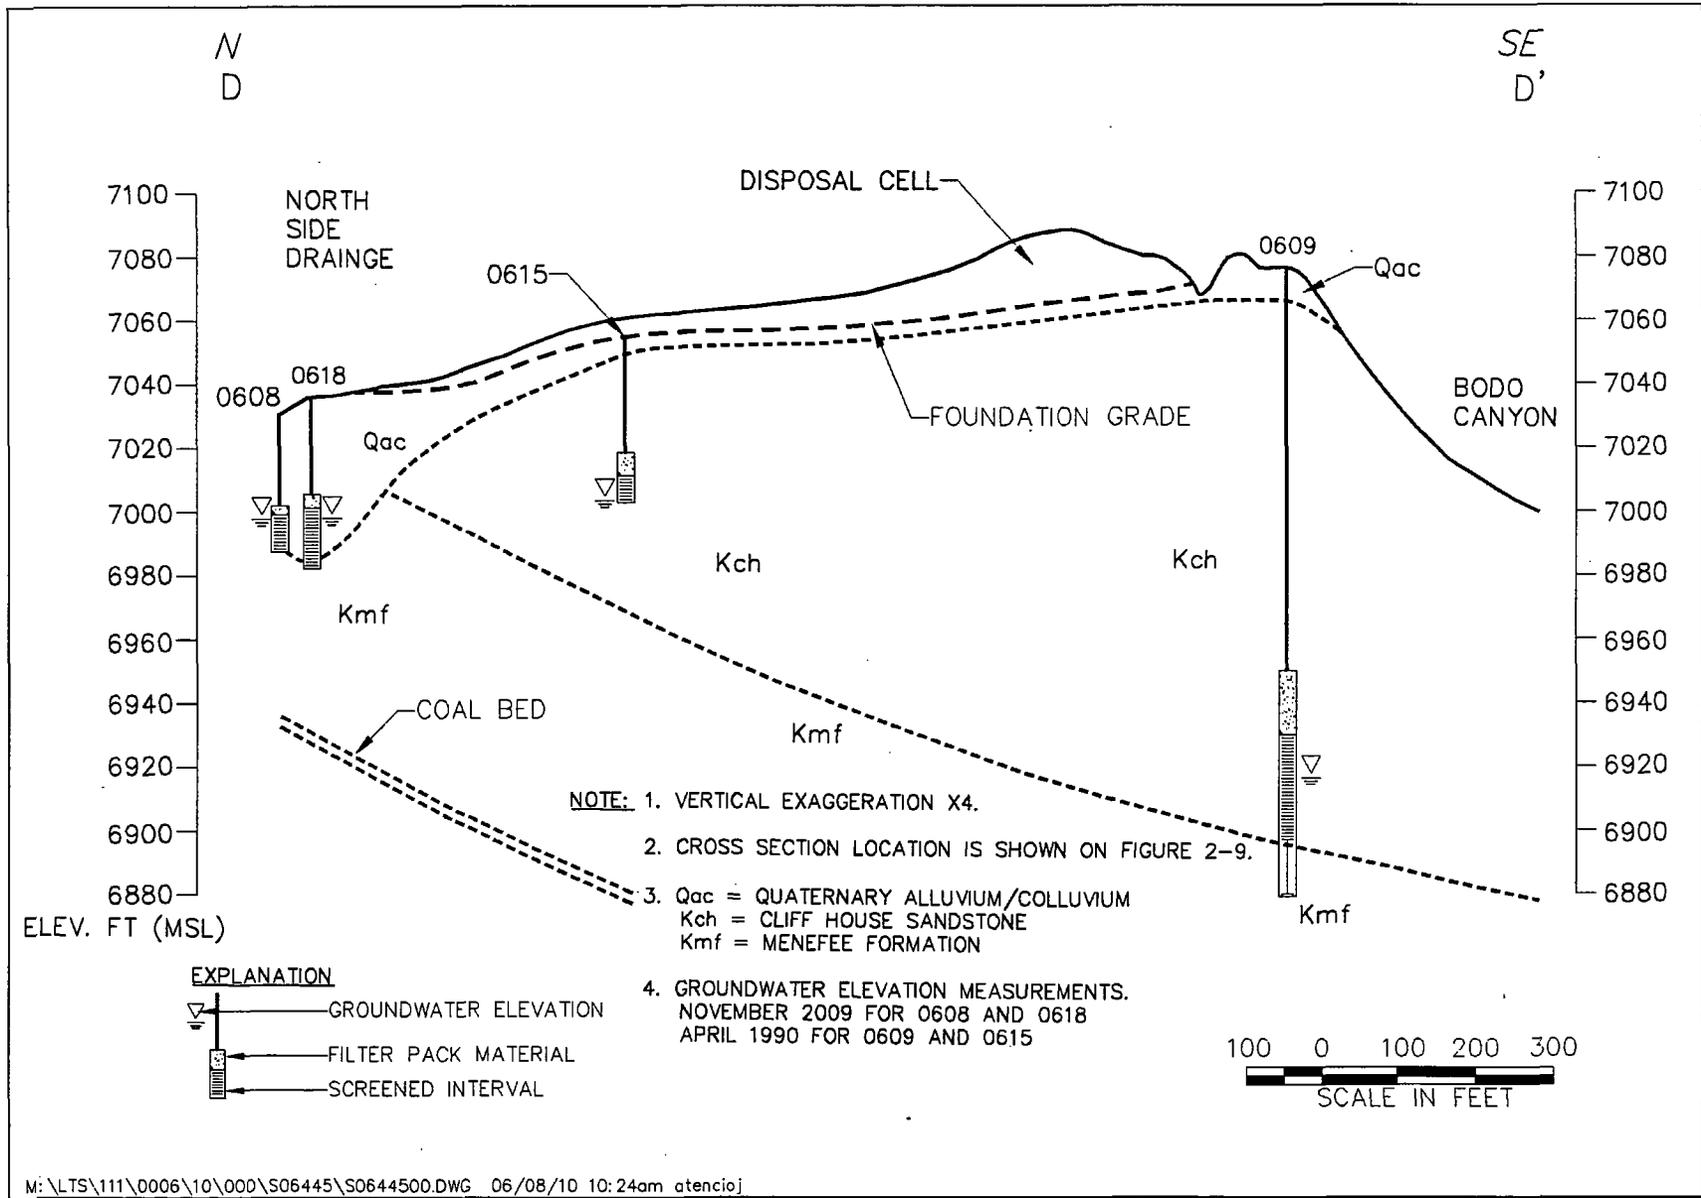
Cross Section D-D', Durango, Colorado, Disposal Site
